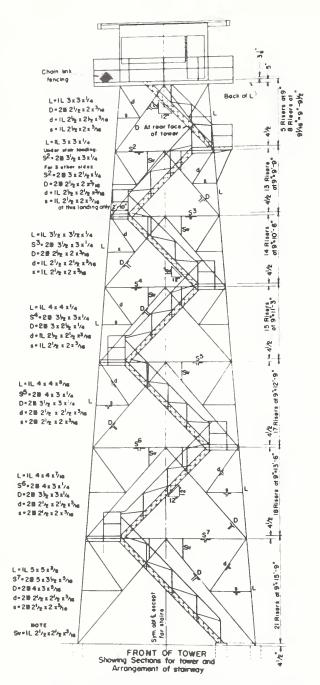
Standard steel lookout towers, 1937, Aermotor type (L-1400 series), 80 to 120 feet; Standard Lookout Structure Planbook, 1938.
